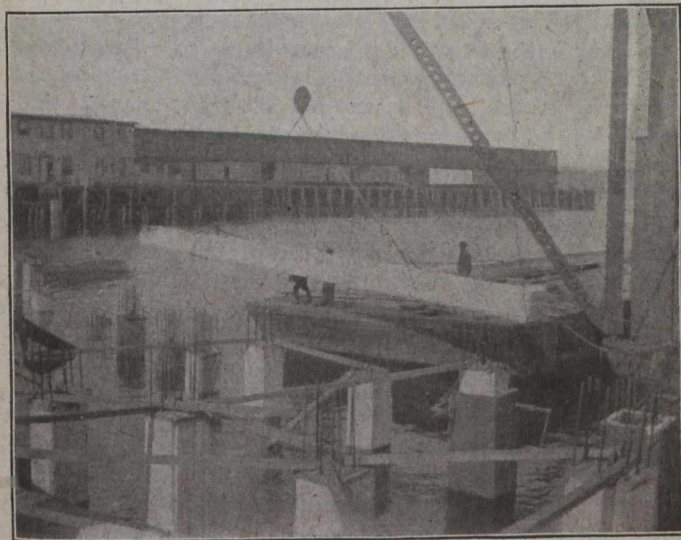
Pier No. 2—Swinging Concrete Pile
